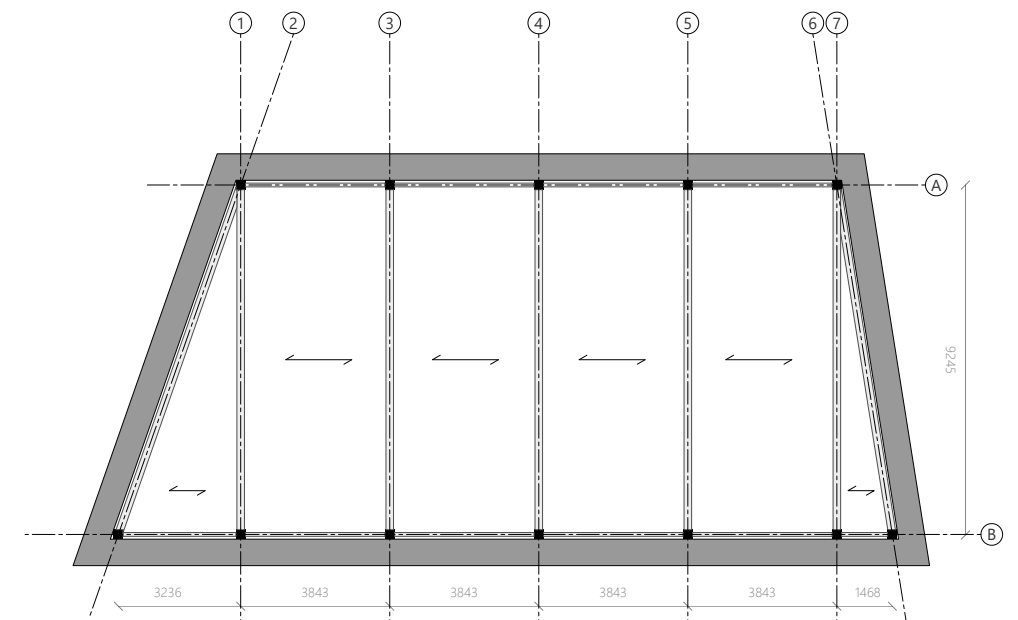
Structural drawings of the laboratory 1:200 (Own work, 2024)
